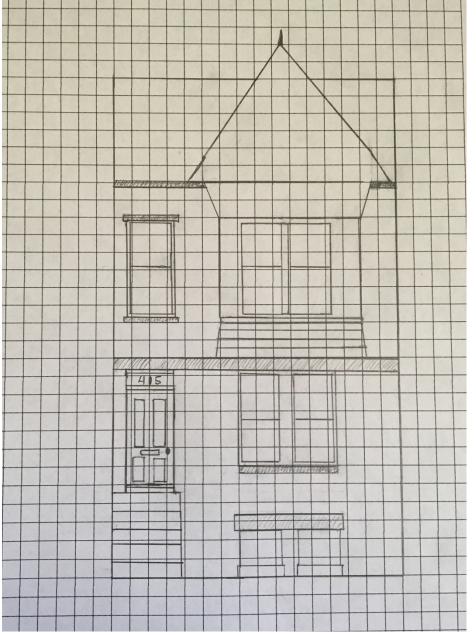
To-scale drawing showing existing front façade. One square (1/4'') equals 1 foot.
